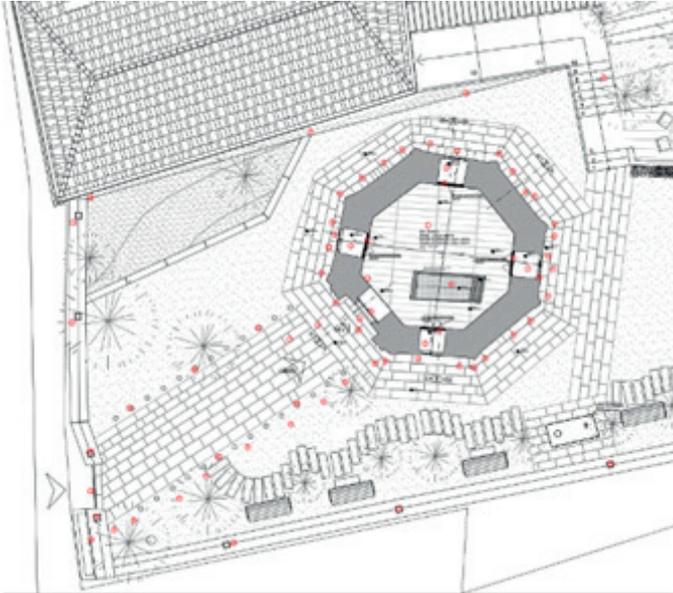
Ismail Dede Tomb Restoration Project Ground Floor Plan
